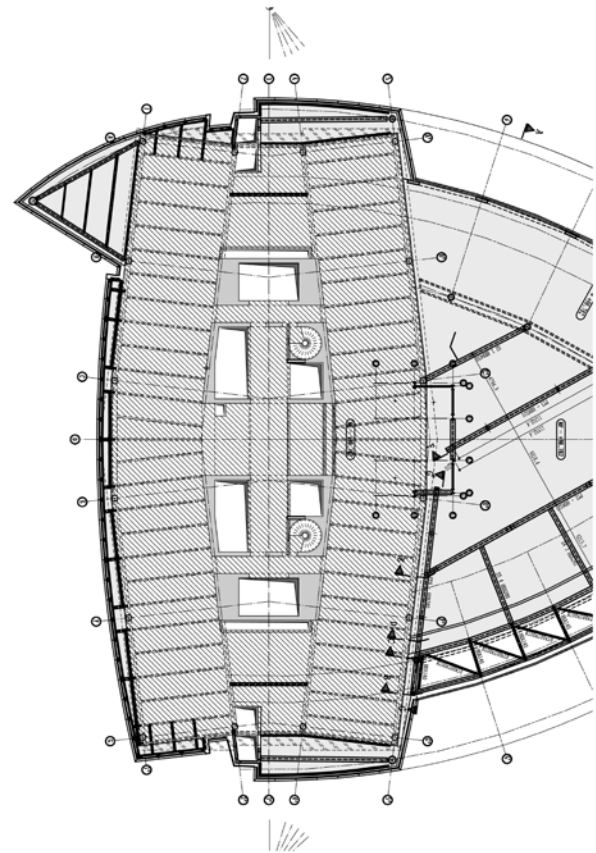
Madou Plaza Building (Floor Plan) – the shaded section indicates the existing Madou Plaza tower limits before renovation, source: ASSAR Architects, Brussels, lead and design architect/Waterman TCA
